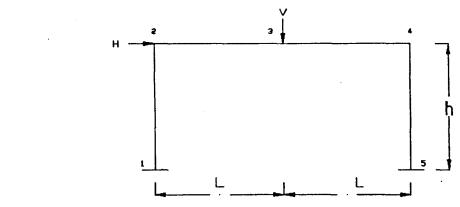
FRAME GEOMETRY AND LOADING OF EXAMPLE 1
